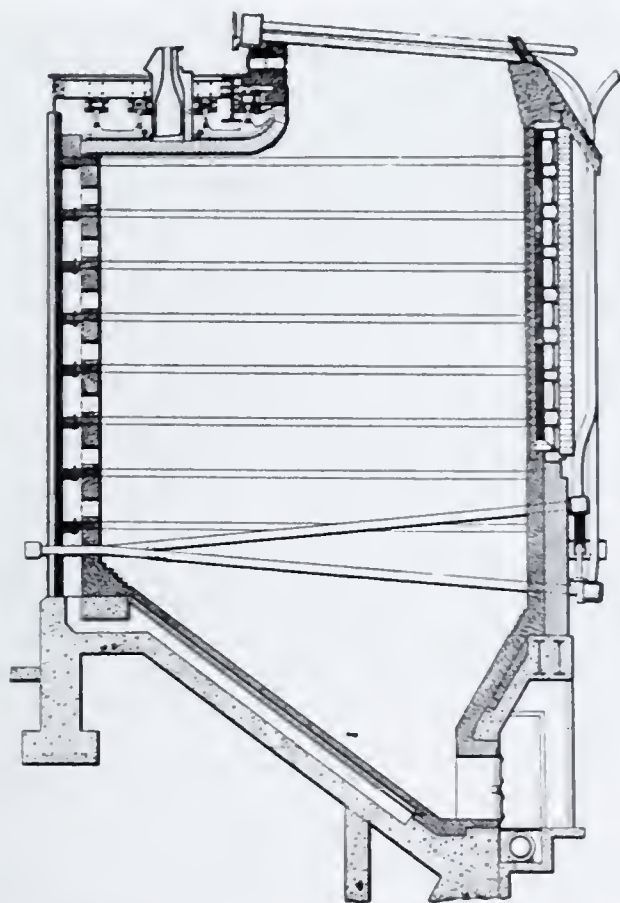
Suspended Arch in Connection with Pulverized-Fuel-Fired Edgemoor Boiler.
